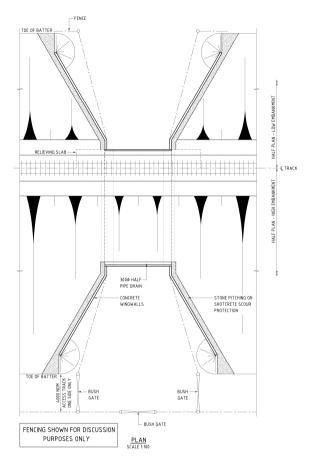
Indicative 7 m Stock Underpass. Type A Abutment Details
